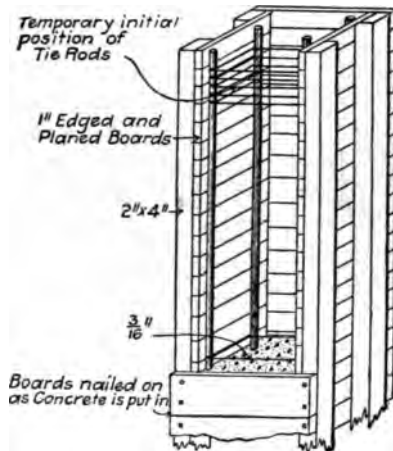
Column Form for Central Felt and Paper Co.'s Factory, Long Island City, N. Y.
